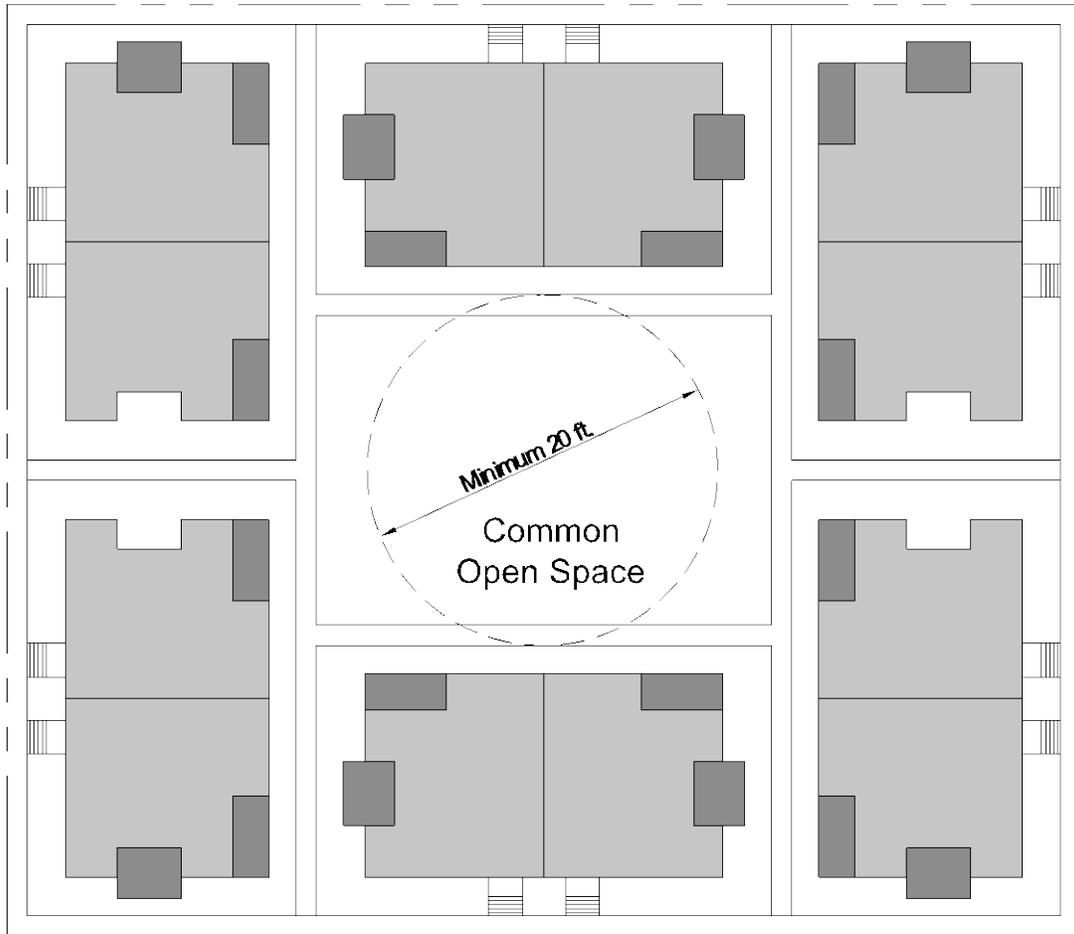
D.1.b: MINIMUM REQUIRED COMMON OPEN SPACE DIMENSION
